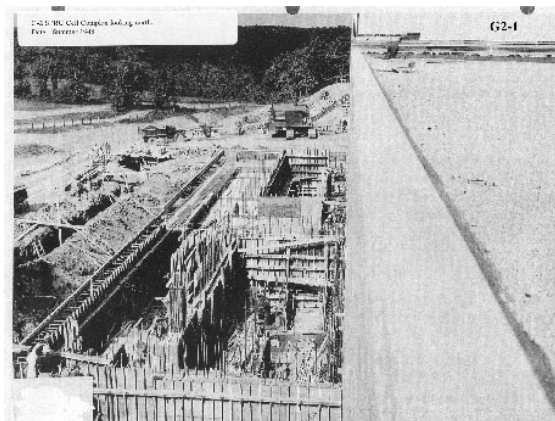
Photo G2-1, G2 Under Construction Showing Interior Wall Construction, Summer 1948
